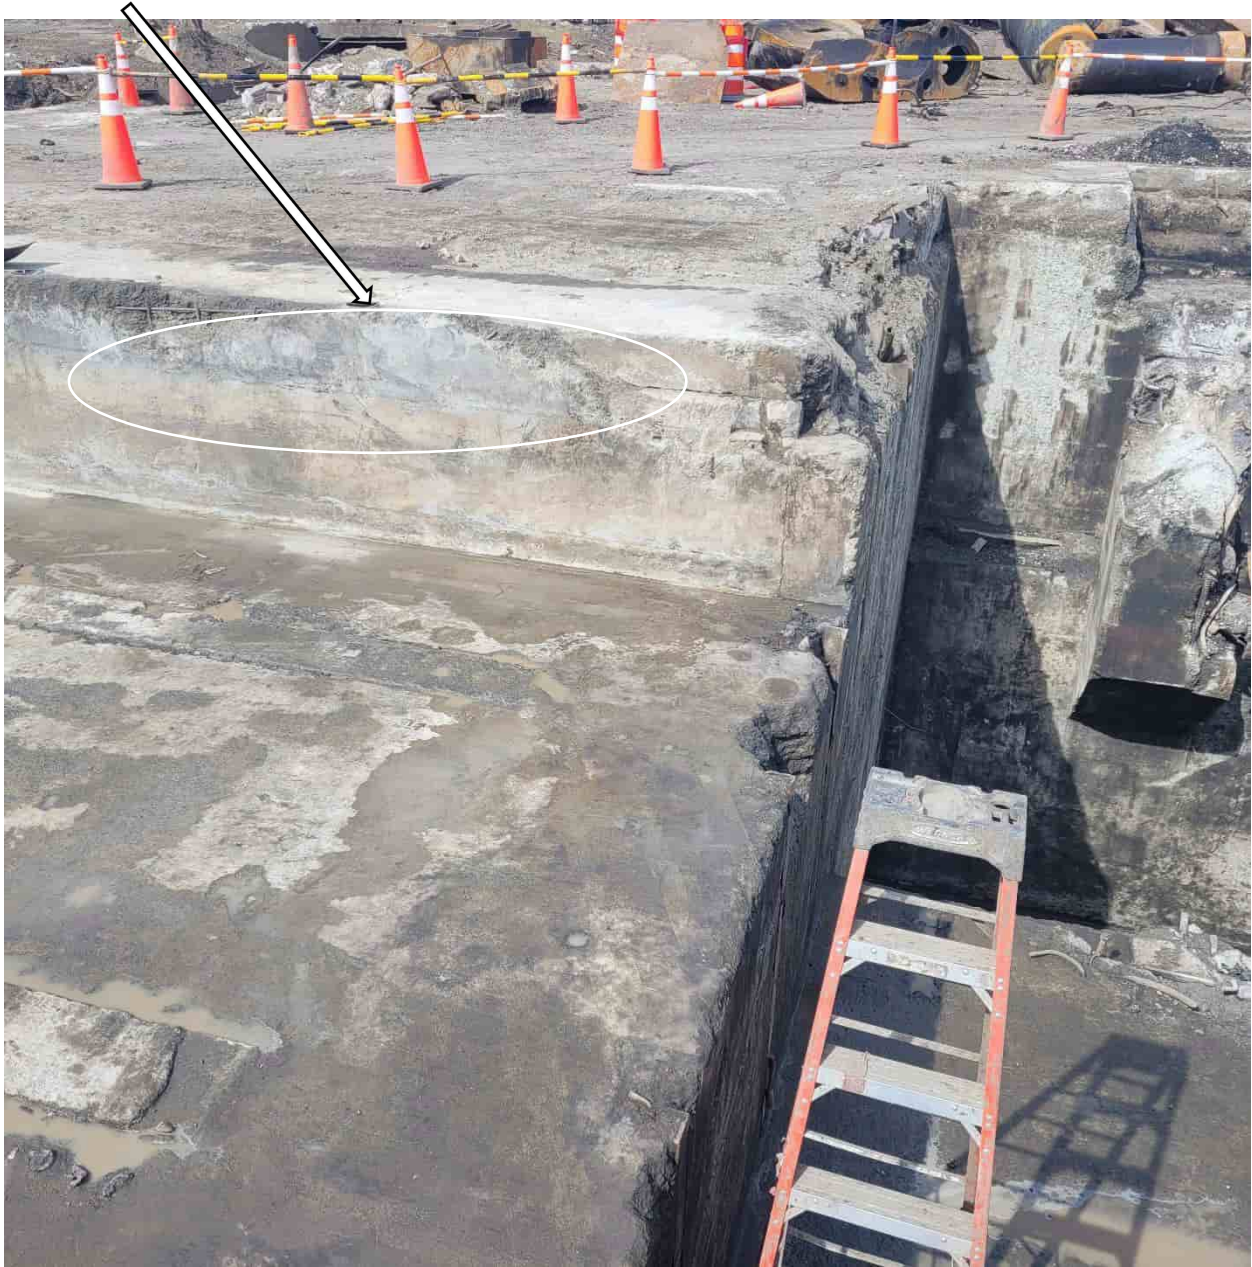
Monday 4/10/23 level 1 cleared - south wall
